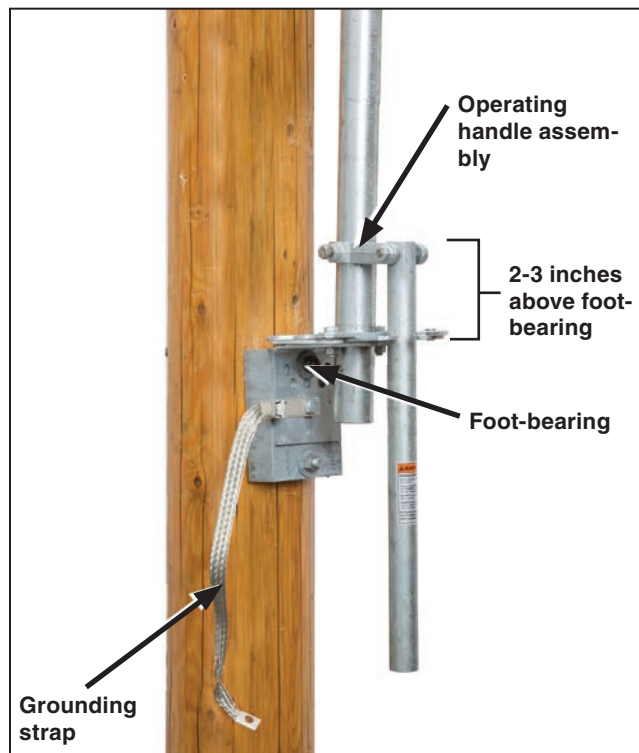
Install the foot-bearing assembly so the operating handle assembly is two to three inches above the foot-bearing assembly.
